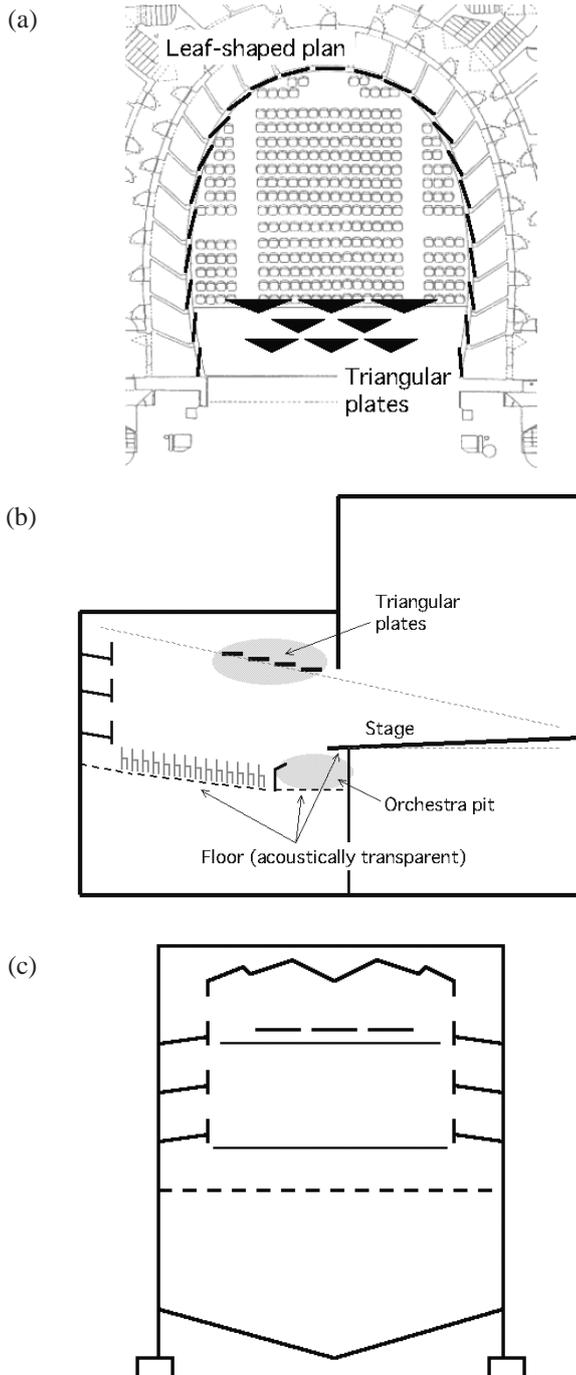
Proposed scheme of an opera house. (a) Plan. (b), (c) Cross-sections.
